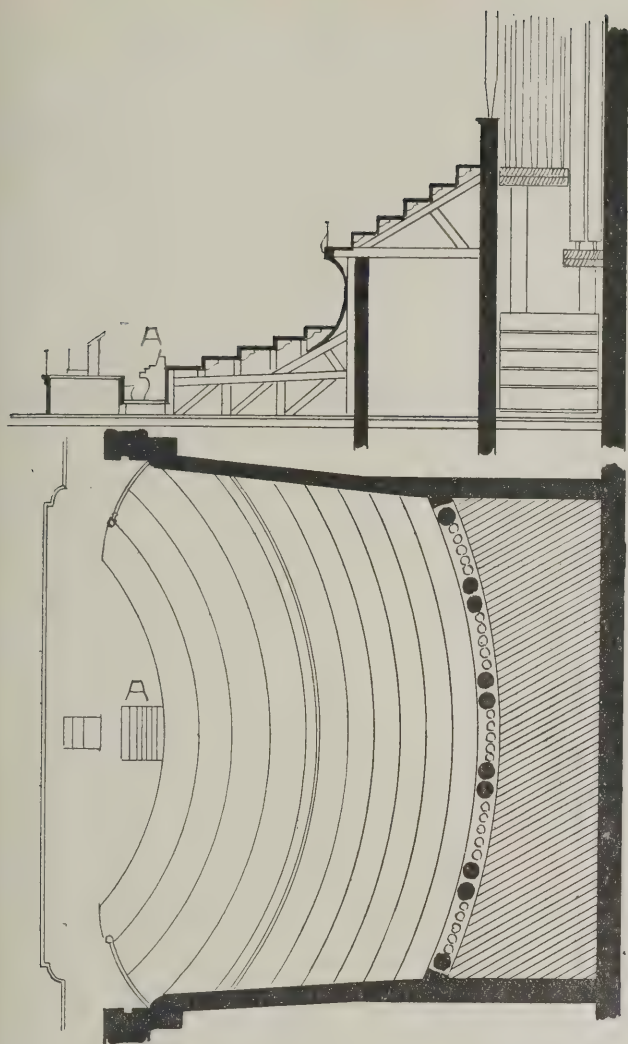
SECTION AND PLAN [FOR A NEW CONSTRUCTION OF THE ORCHESTRA.
